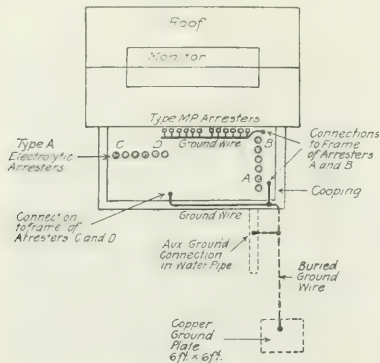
Diagram Showing Details of Connections of 600-Volt Arrester.
